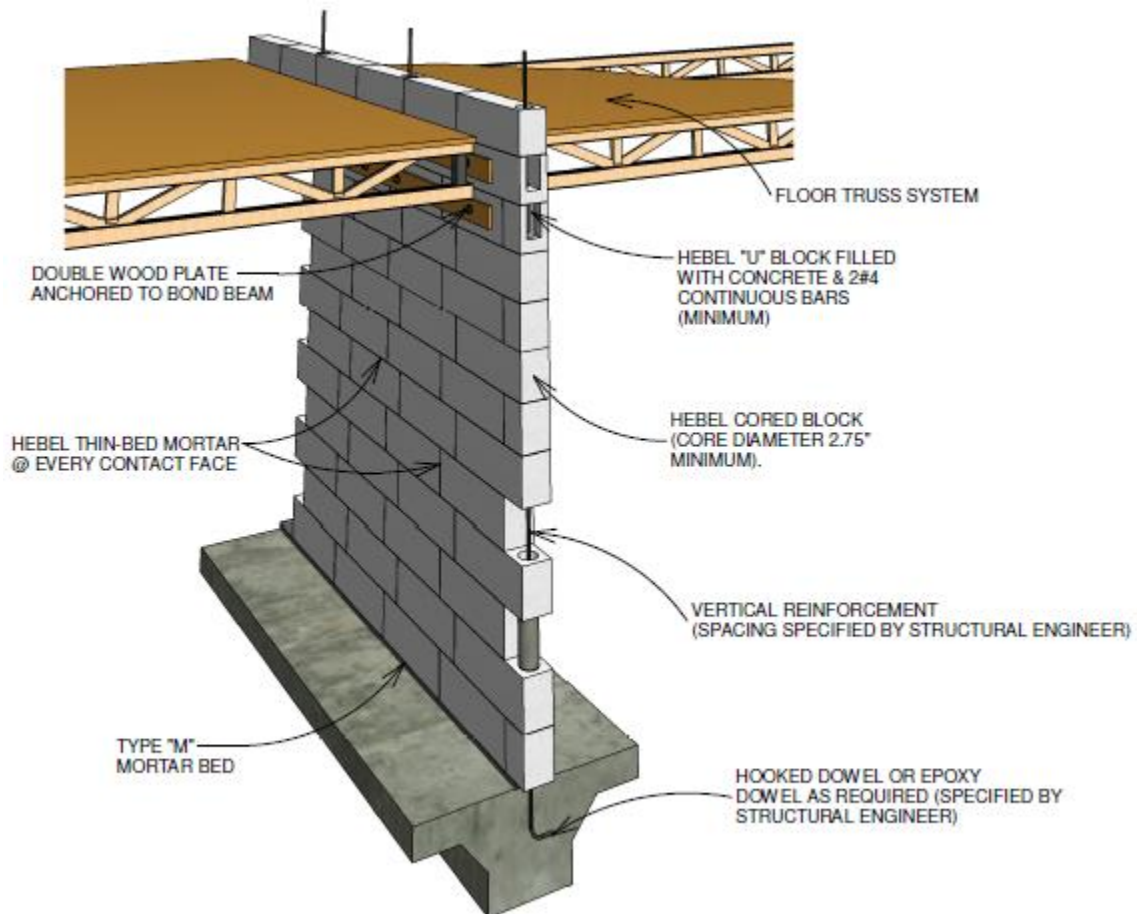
HEBEL MASONRY – TYPICAL WALL SECTION
